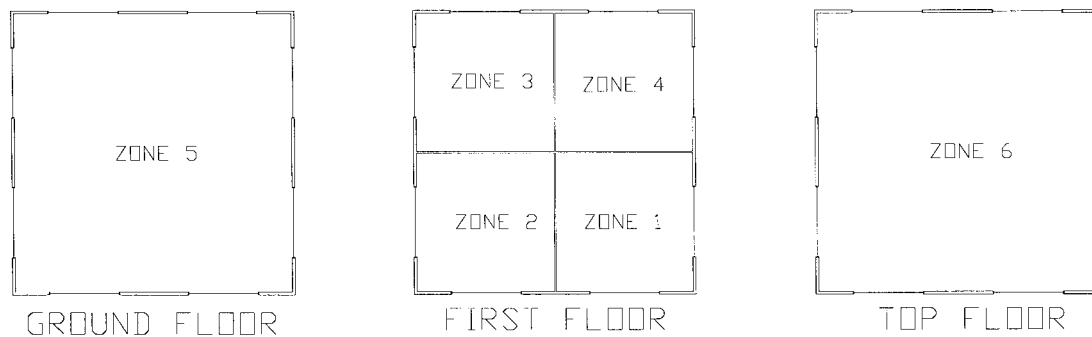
Plans of the studied building having 1:1 B.A.R.
